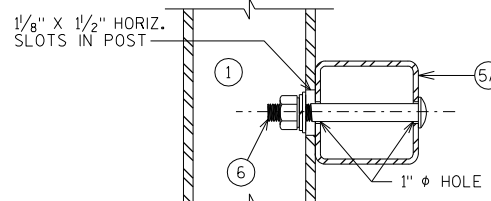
DETAIL AT END POST THRE BEAM RAIL ATTACHMENT
